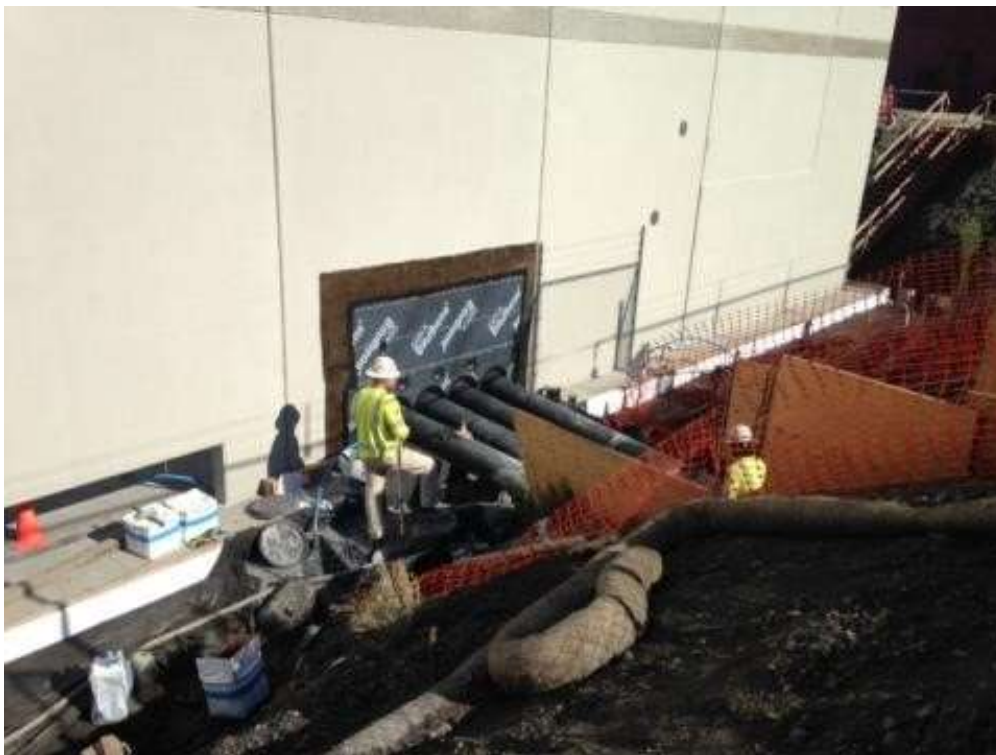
Installing conduit pipe in GIS Building Panel 4 in the Potrero Switchyard. View northeast, November 12, 2015. Photo courtesy of PG&E.
